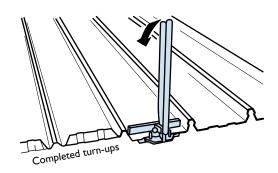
KLIP-LOK tool ready for turn-up
